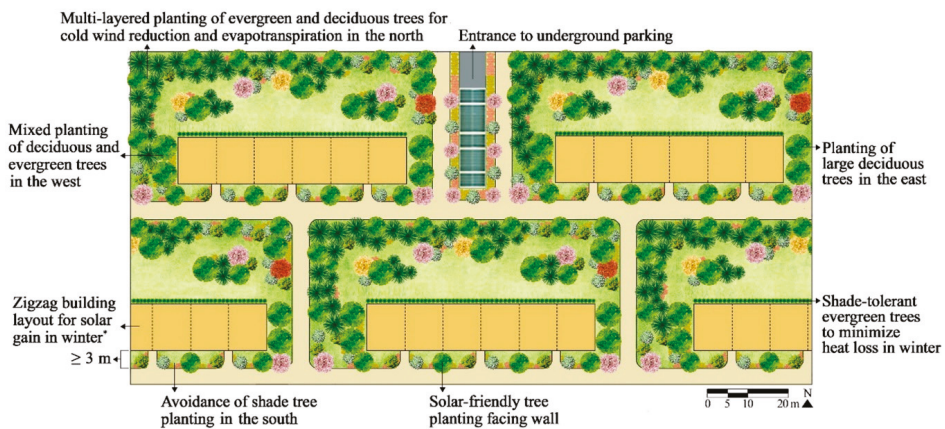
Planting design model for building energy savings in multifamily residential sites.
